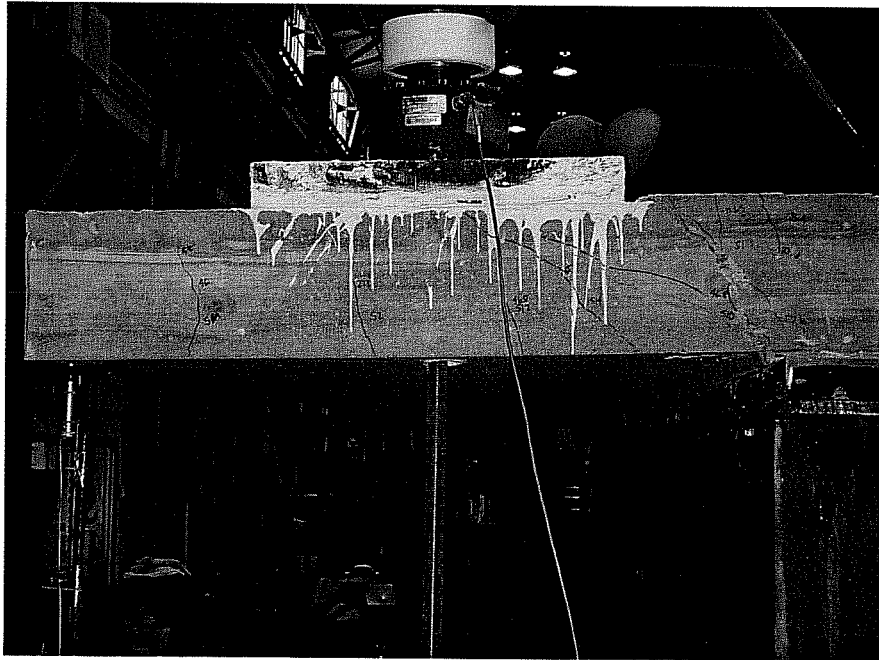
Failure of Overhang Test Area 2, side view, facing north
